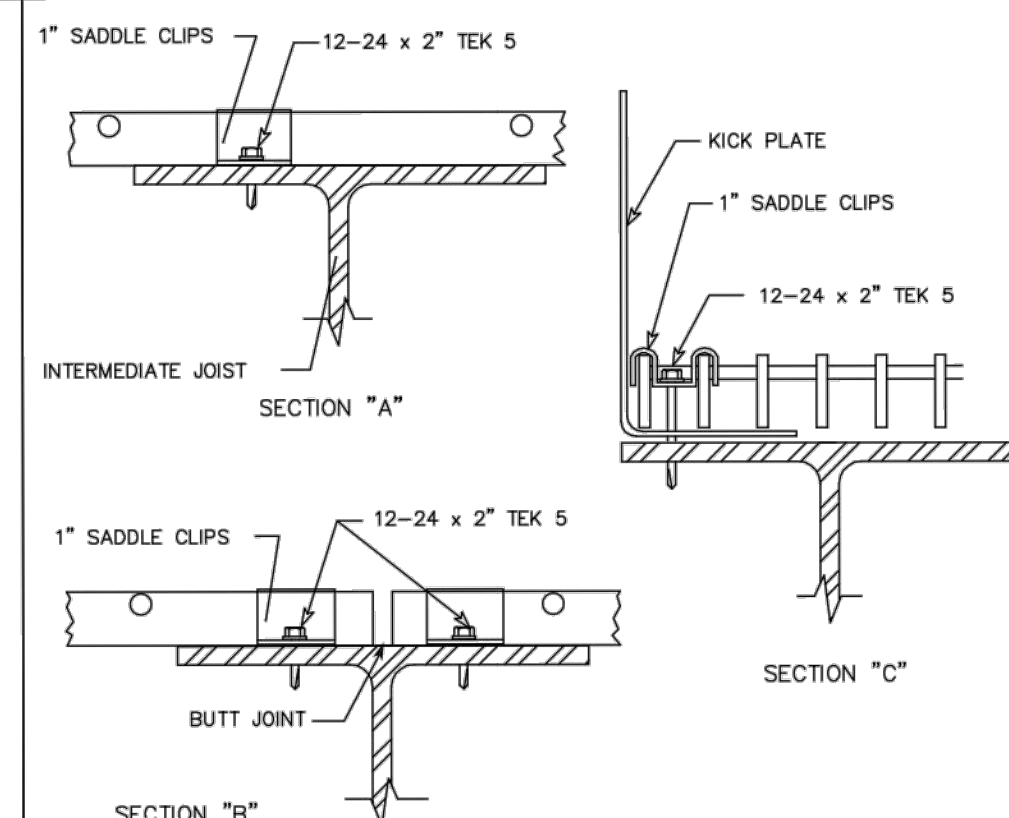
A1 BAR GRATING INSTALLATION LAYOUT WITH 'C' SECTION
